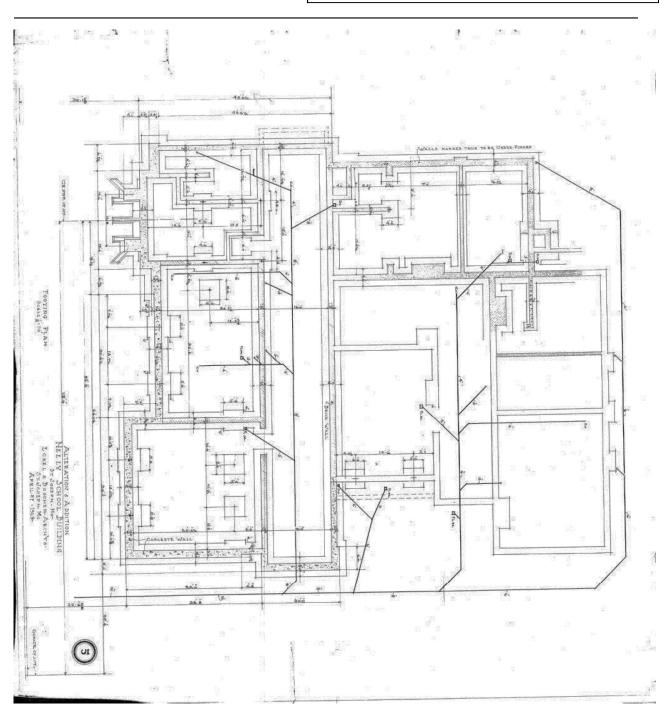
Eckel and Boschen Architects, Footing Plan, April 1909 (Architects 1909)
